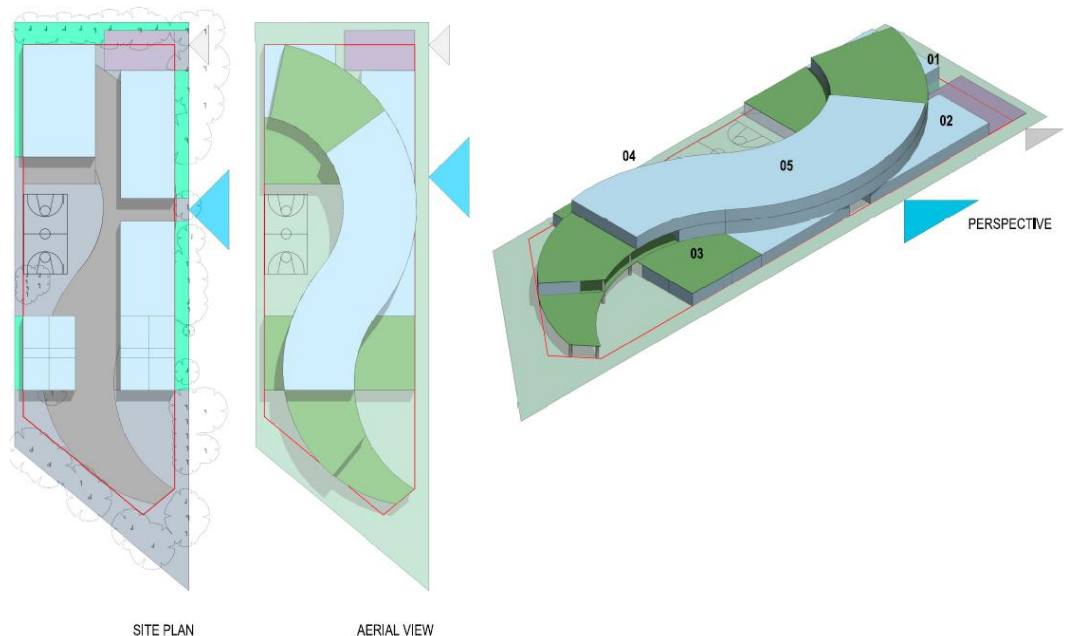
Extract of Option 3C – Remove All Buildings and Construct New School (In Single Stage)
